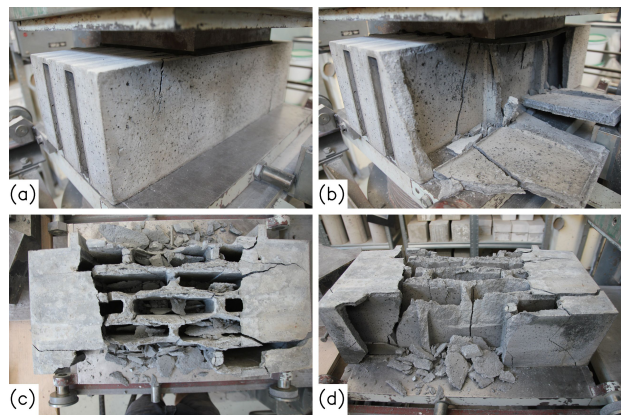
Phases of block collapse with a cast top: (a) A crack is formed in the sample near the edge of the steel plate; (b) an entire flat wall of the block falls off; (c) material crushing below the steel plate; (d) formation of vertical cracks.
